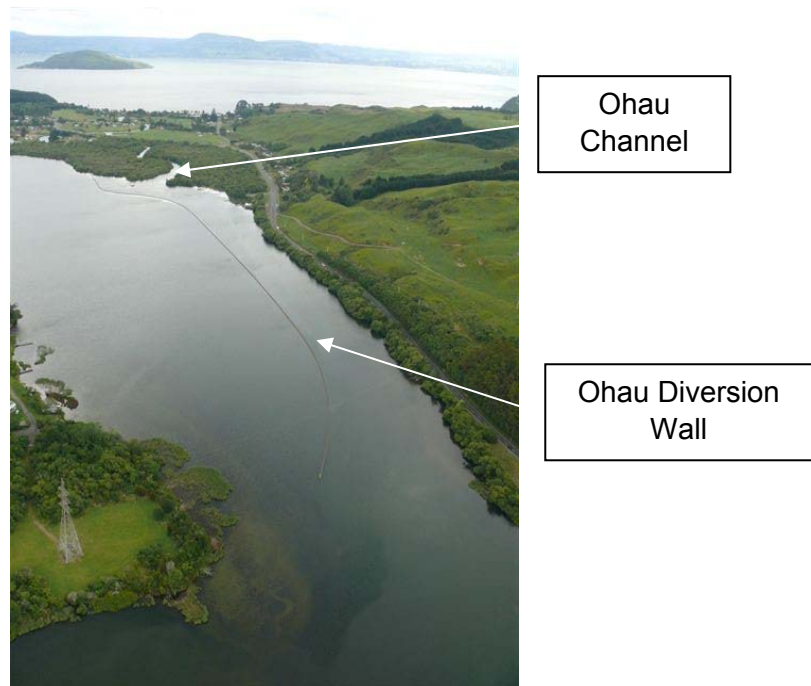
View of Ohau Diversion Wall taken from above Okere Arm looking south west towards the mouth of the Ohau Channel with Lake Rotorua in the background.
